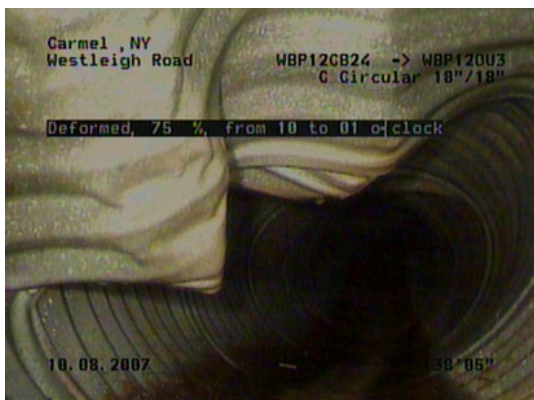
Stormwater collection system inspection: pipe deformation.
